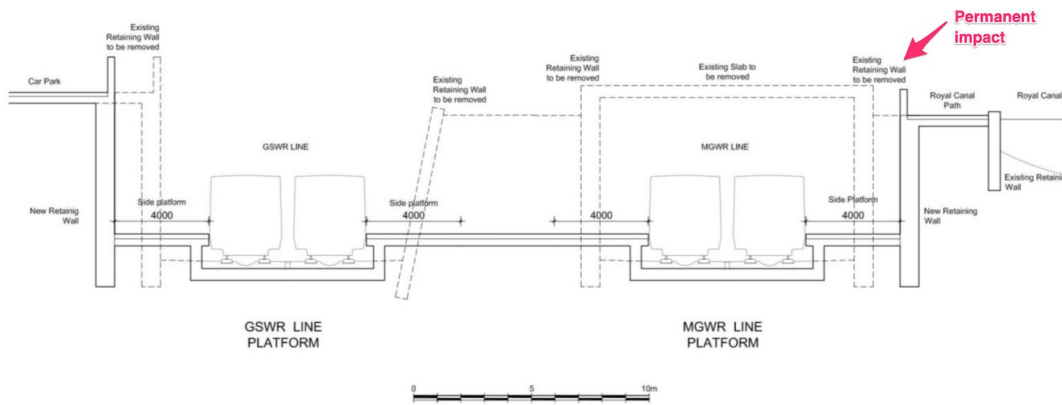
Cross Section through Irish Rail Lines and Royal Canal (looking east)
